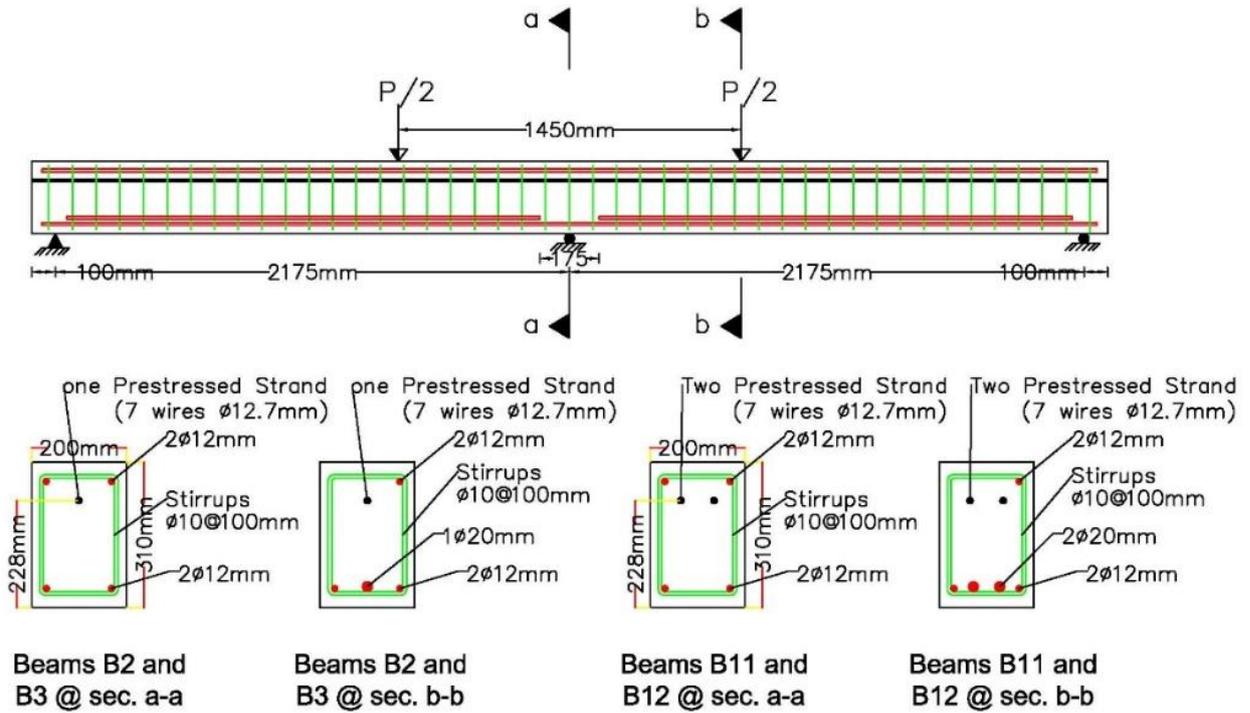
Geometry and reinforcement details of continuous beams (B2, B3, B11 and B12).
